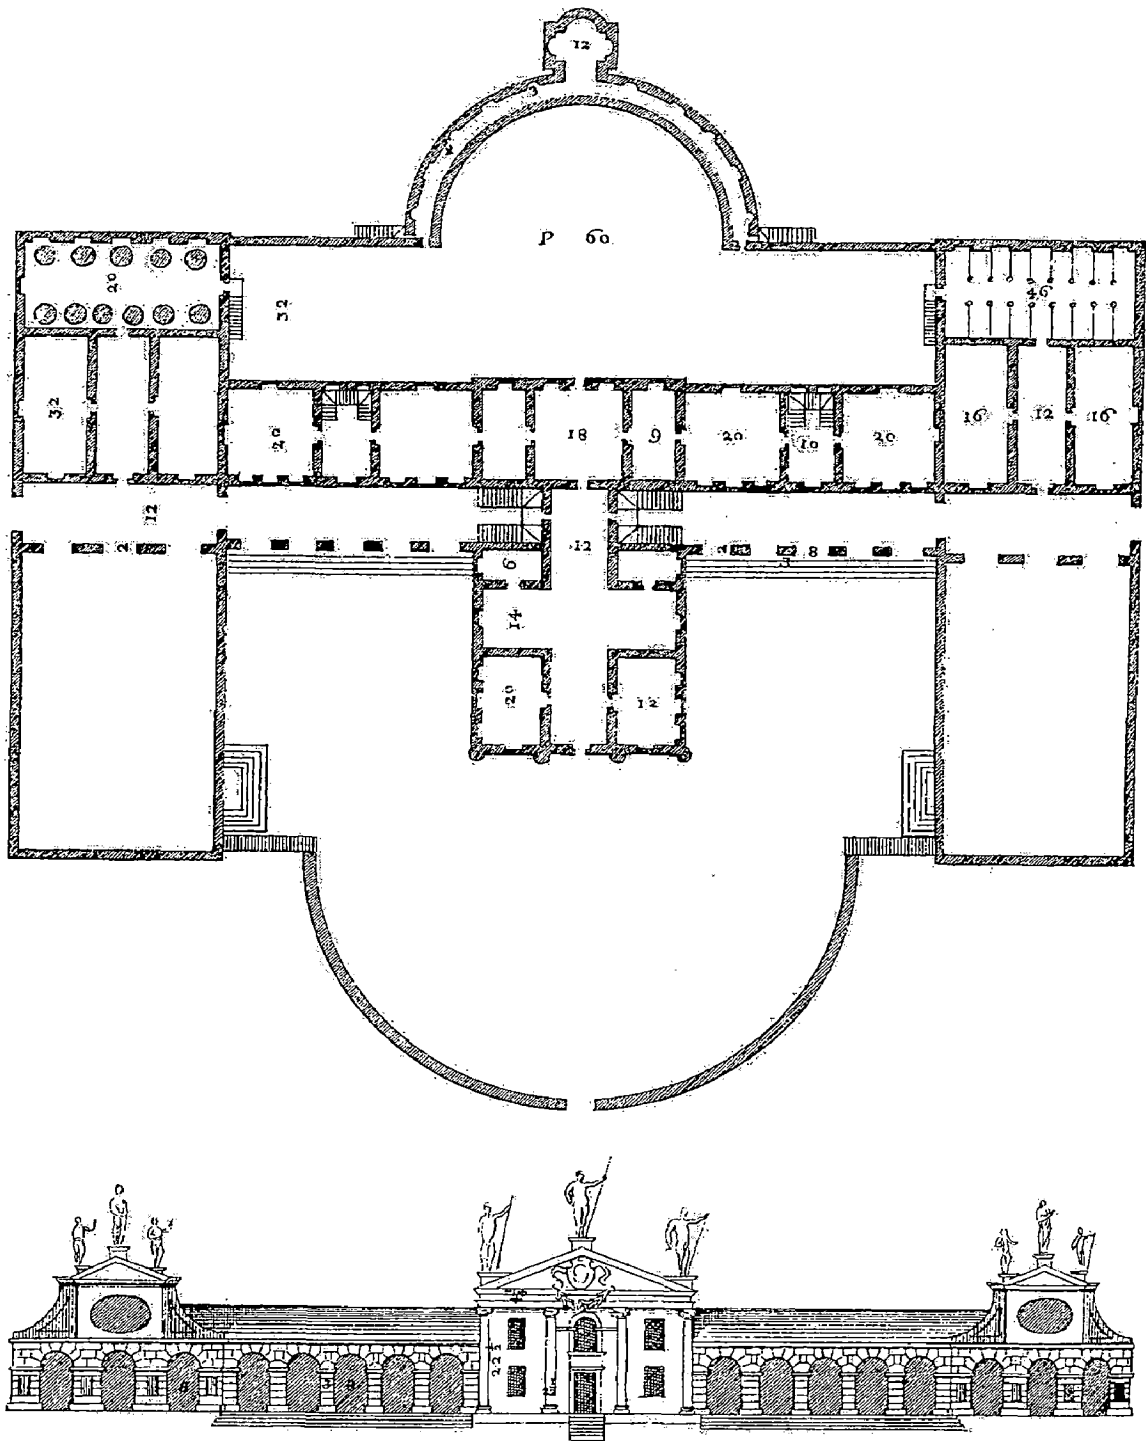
Villa Elettlo De Aquileia and Marc' Antonio De Barbari at Maser in plan and elevation
